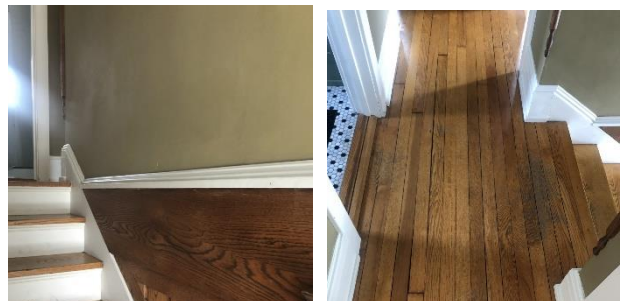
Photograph by Claire Buchinger. *Second Floor Stairwell*. February 25, 2023. Ithaca, New York.
